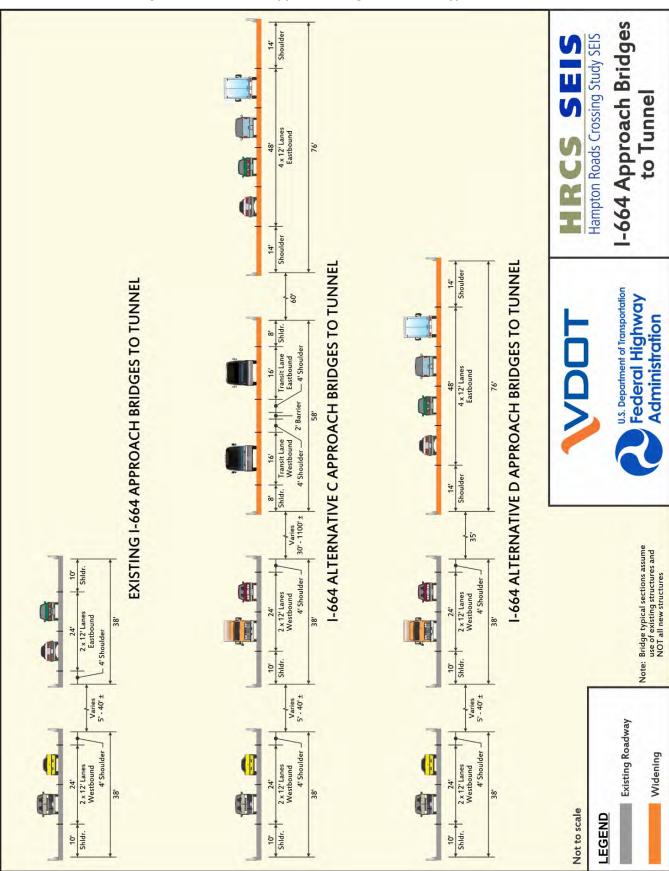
I-664 Approach Bridge to Tunnels Typical Section
